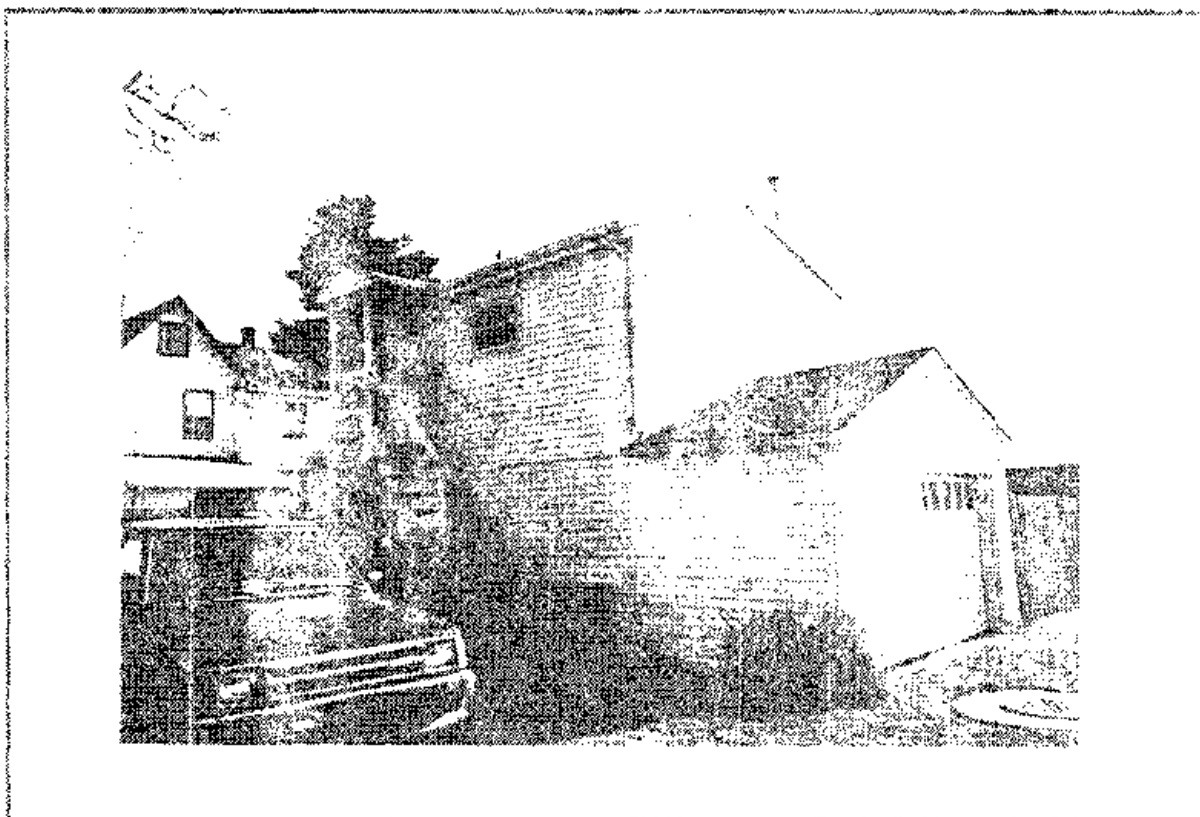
20 Old Hamburg Road, sloping northwest elevation
